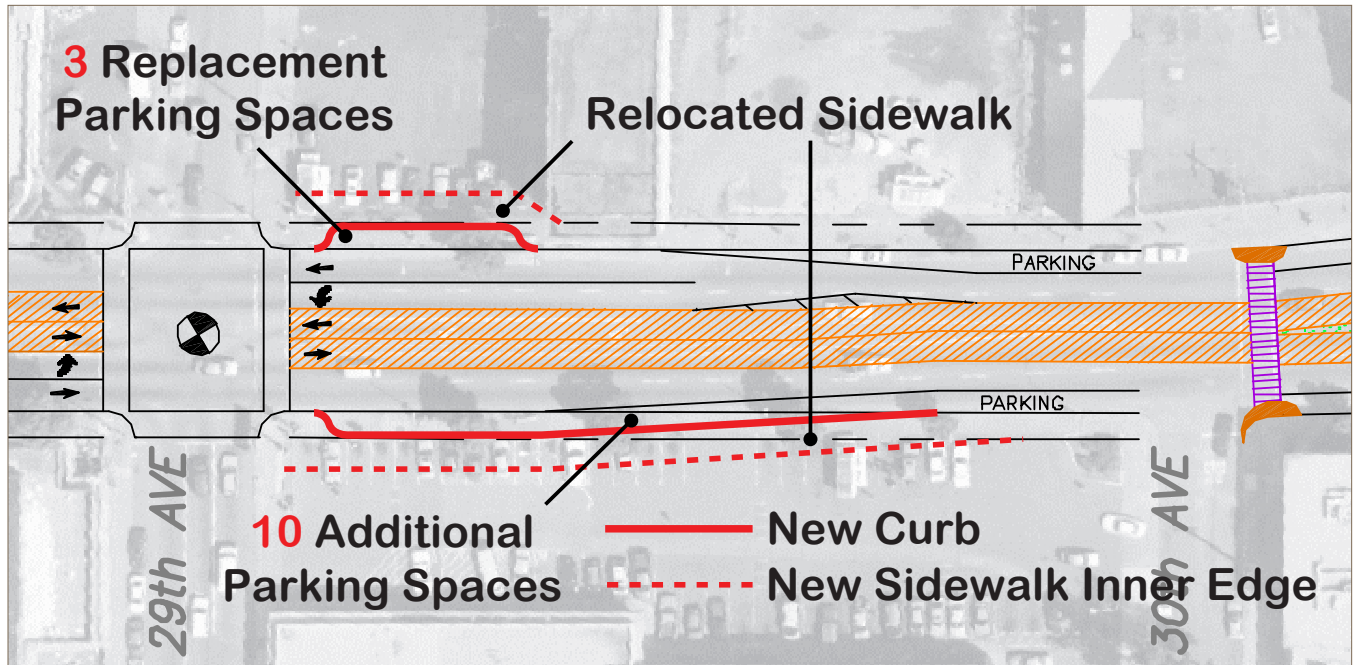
Concept Drawing for Providing Additional Parking at Opportunity Sites
